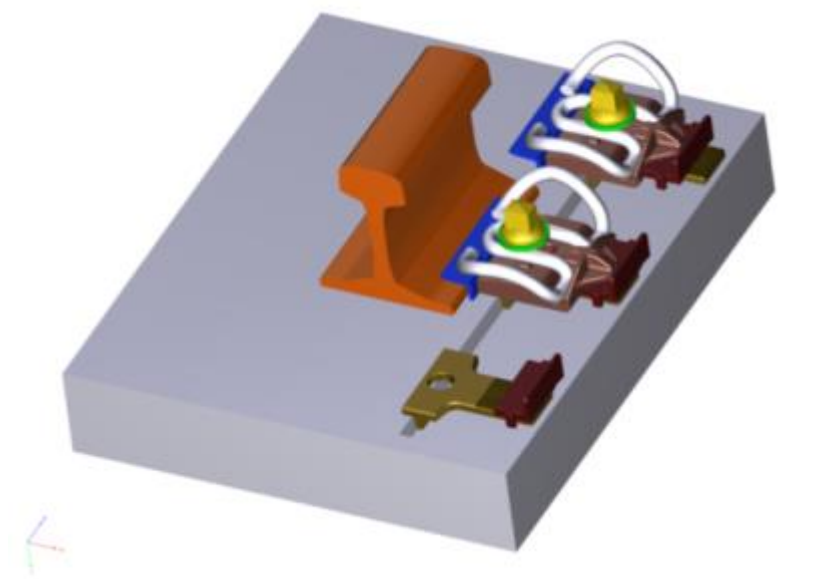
L-TRACK FASTENING SYSTEM, EXTREME POSITIONS
